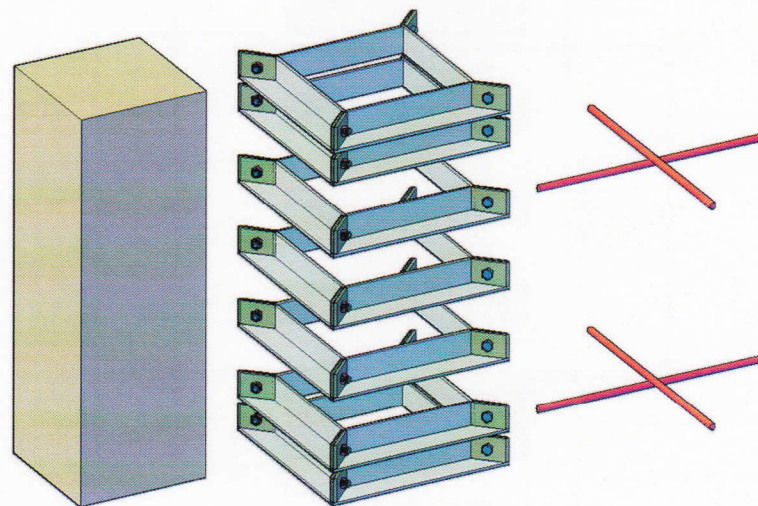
Typical Exploded View of Test Specimen (Specimen S03 as an Illustration)
